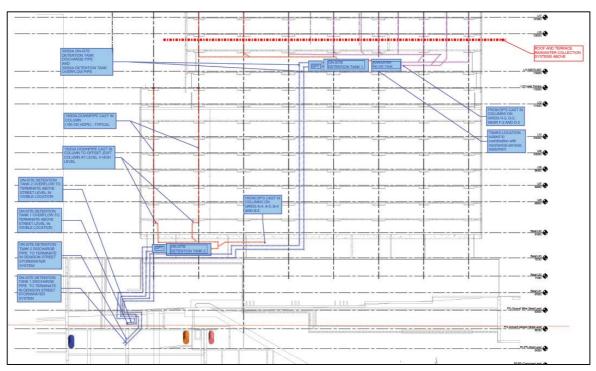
Typical stormwater schematic layout, see Appendix D for full size schematic *Source: Flood assessment and stormwater management report
